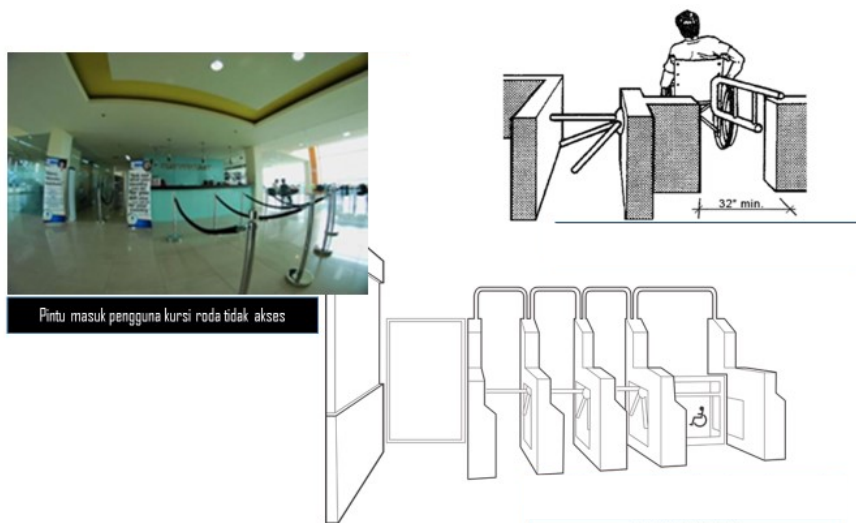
Access to reading room entrance of Tower building is difficult to access by wheel users.
